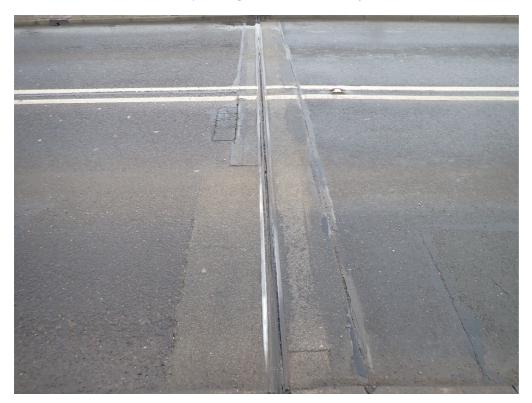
Failed repair and cracking adjacent the East Abutment joint
